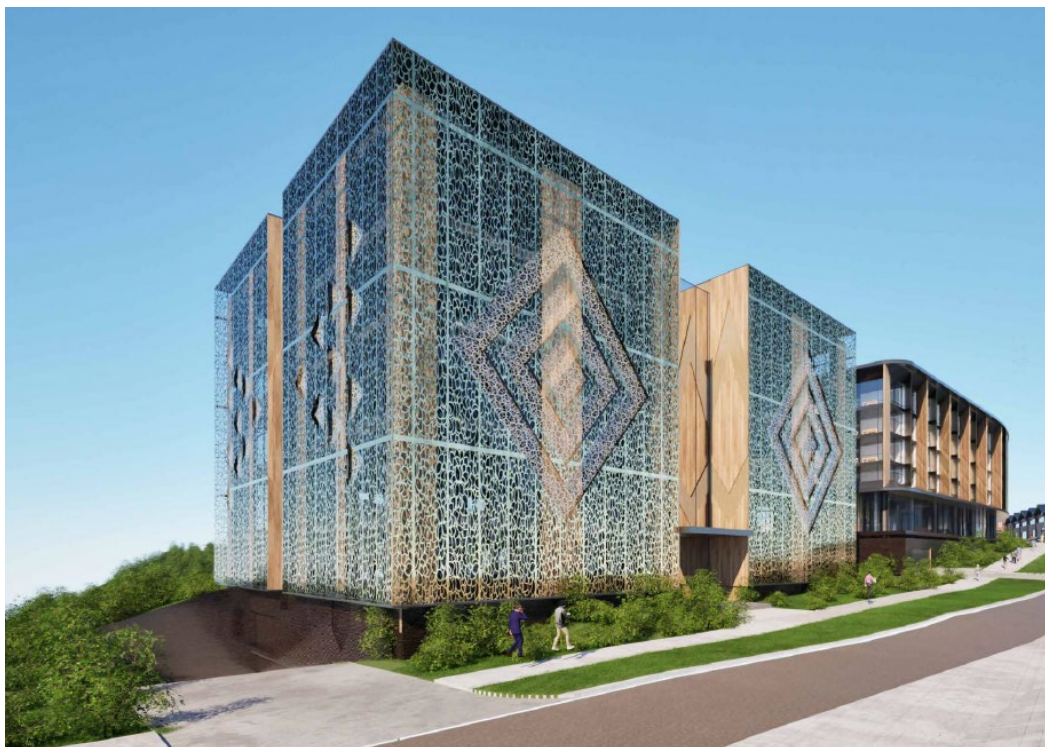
Artistic Render of Building H2 as viewed from Flanagan Road (source: Ignite)
